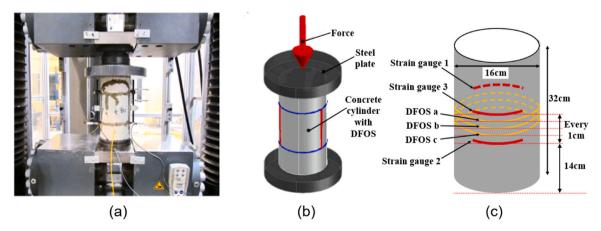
Schematic of concrete specimen compression tests using DFOS: (a) specimen loading setup; (b) cylinder specimen; (c) specimen with instrumented fiber cable (based on [26] and [1]).
